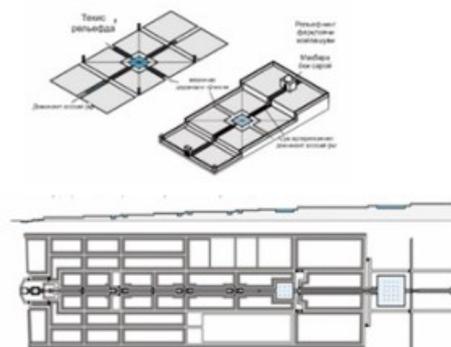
"Chor-bog" traditional water structures. Irrigation of "garden": a) horizontal surface in the plain; b) perimeter construction; c) relief plane, at a slope of 2-10%.
